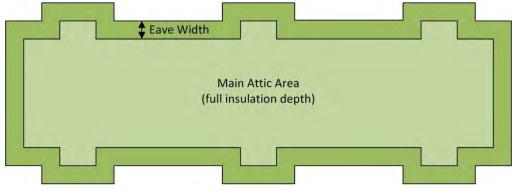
Example of a MURB plan view showing width of the eaves and main area of the roof.
